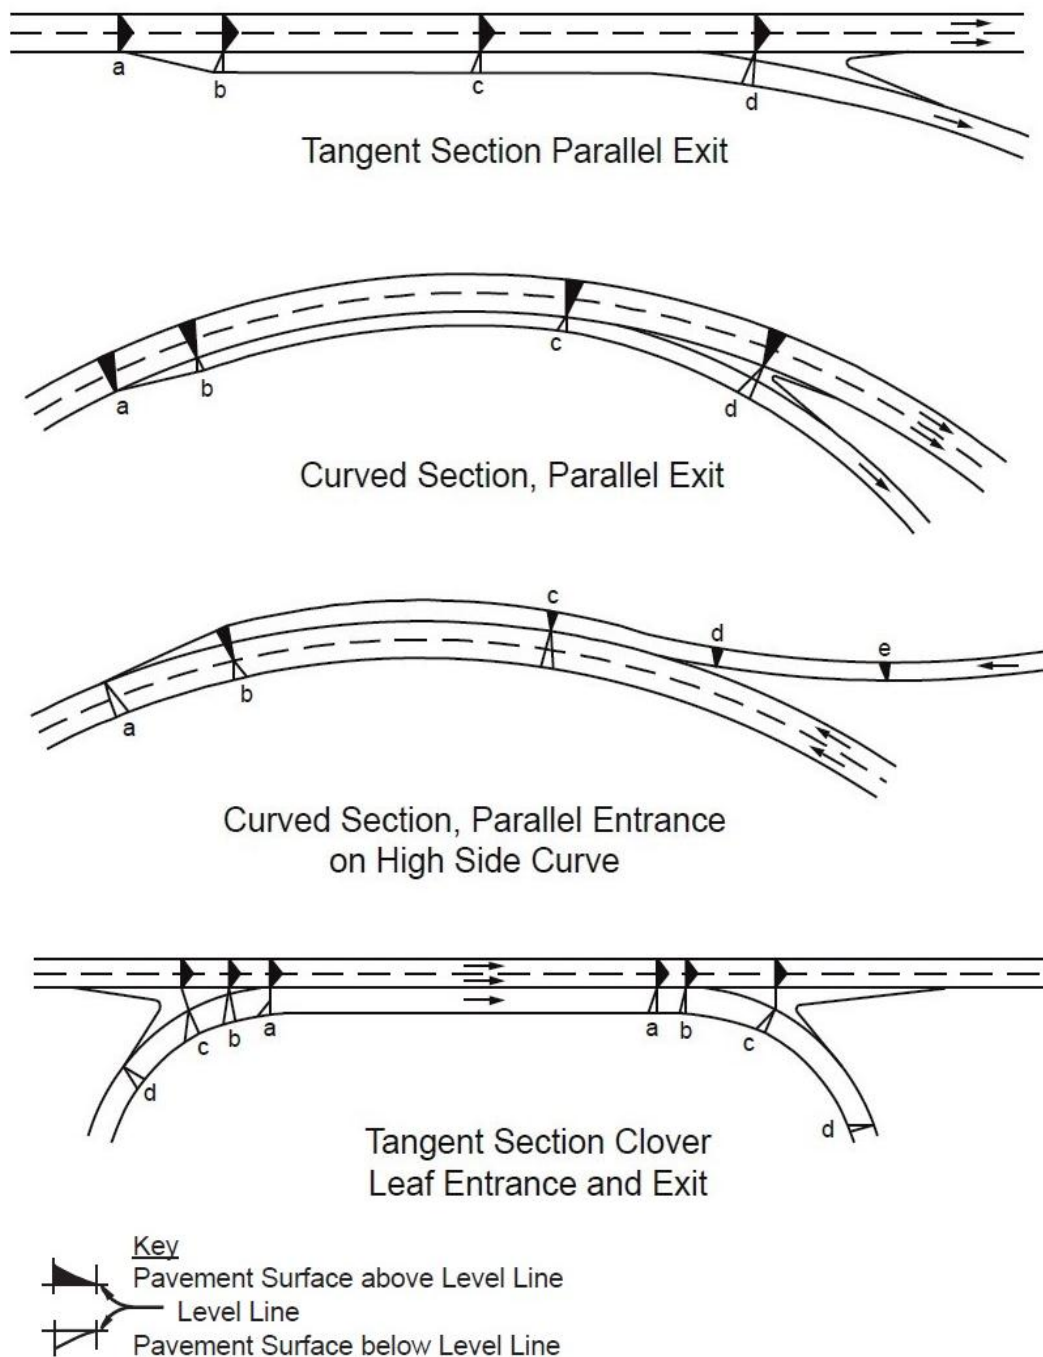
/1: Development of Superelevation at Free-Flow Ramp Terminals [1, p.10-95]
